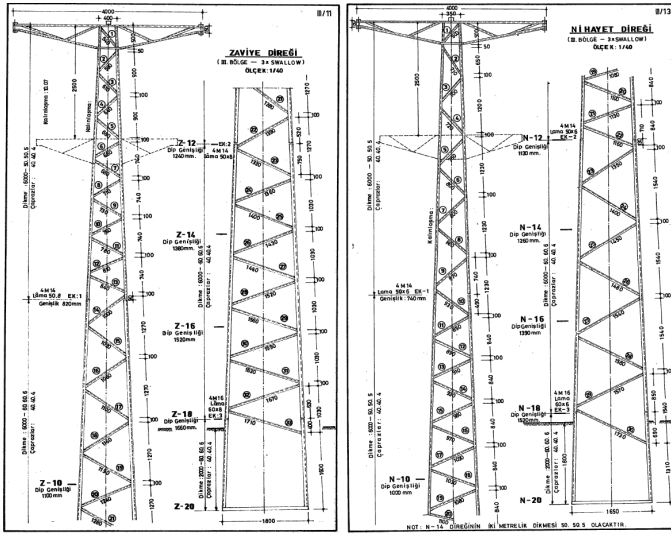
Technical Drawings of 3 AWG air line Z and N Poles [8]
